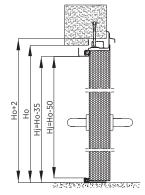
Installation of a double-leaf door with a corner frame without a thermal break to a masonry wall – vertical cross-section
